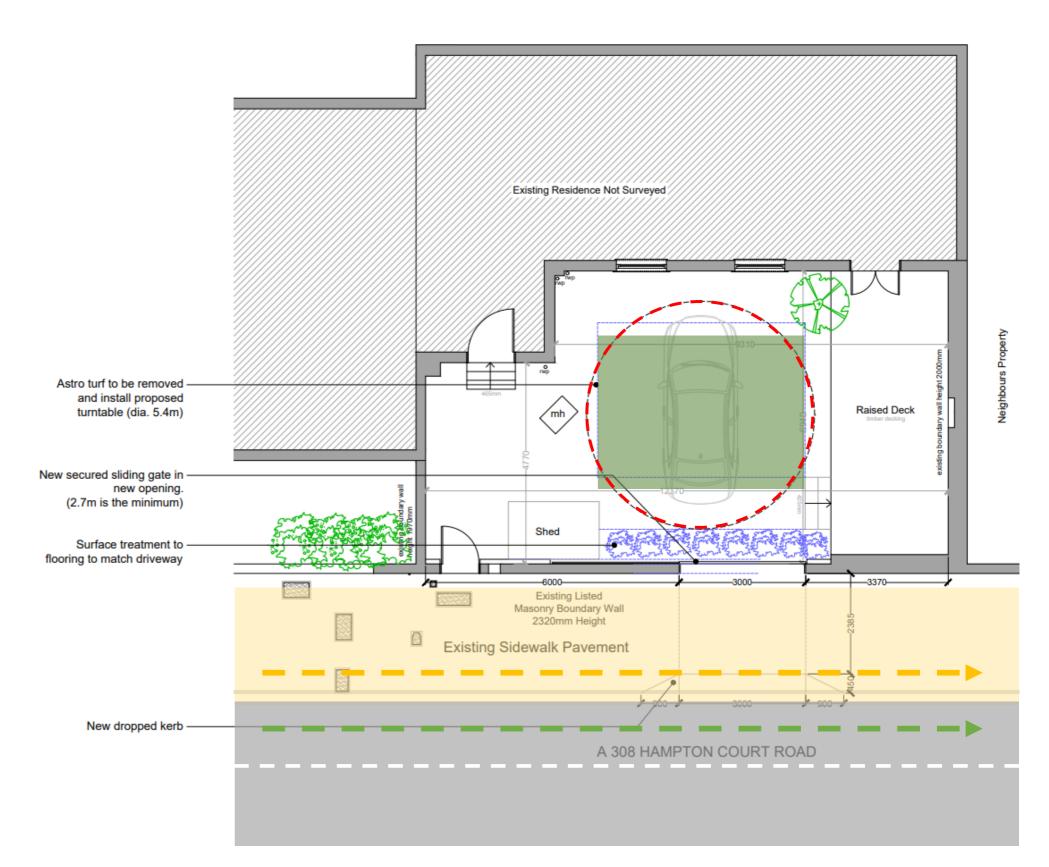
Proposed plan of the new measures focussing on the external spaces.
